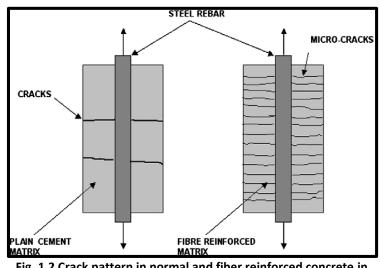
Crack pattern in normal and fiber reinforced concrete in the members subjected to tension [1]
